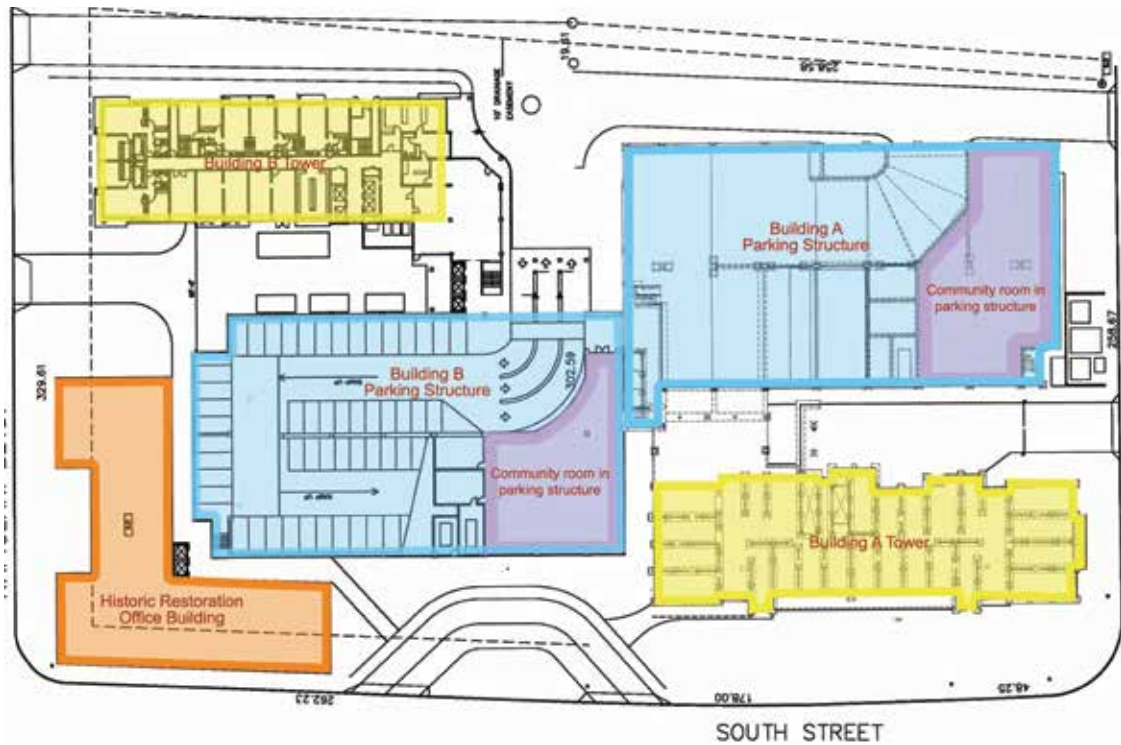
801 South Street site plan demonstrates how two projects were slotted in on a single site by sliding the Building B parking structure and the Building A parking structure up against one another. © Downtown Capital LLC
